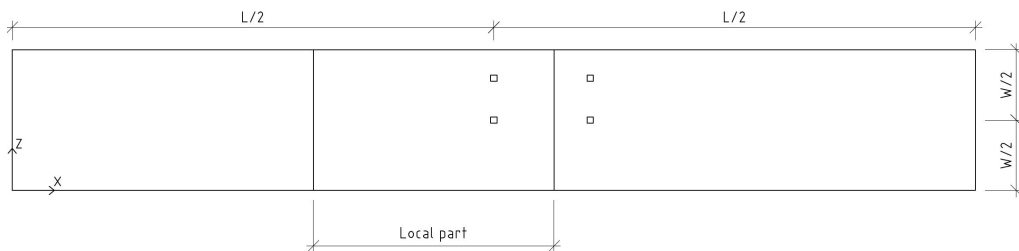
The heaviest axle load is placed between two truss joints, load position (b).
